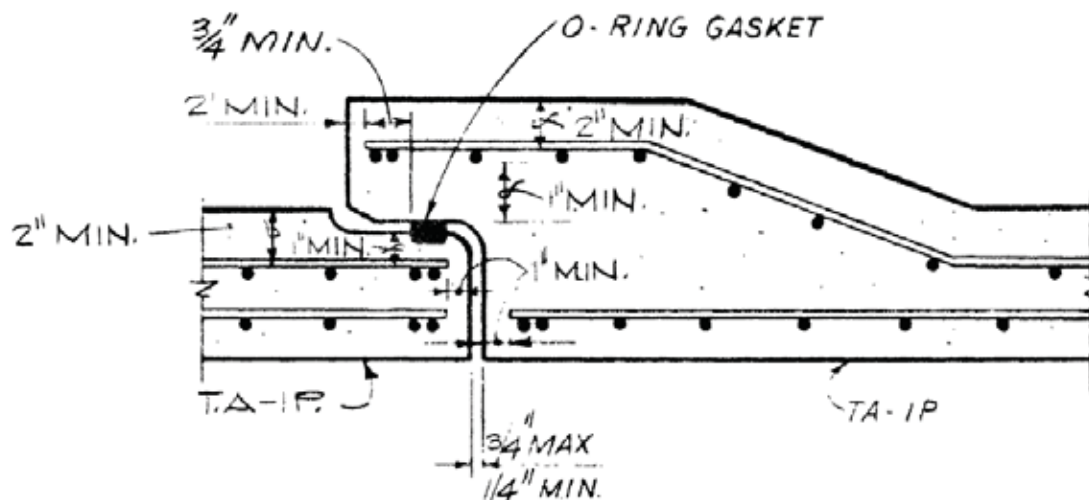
Typical reinforced concrete pipe bell and spigot gasketed joint
